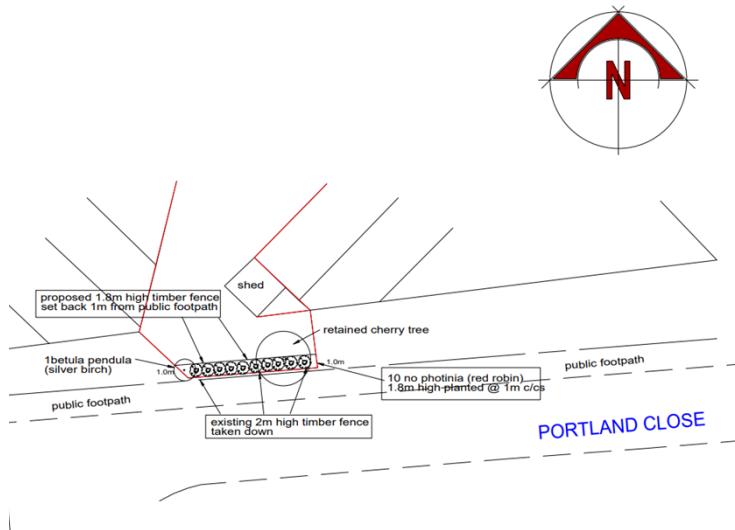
P/09288/002 Extract of site plan, drawing 3103/25/06 rev D
